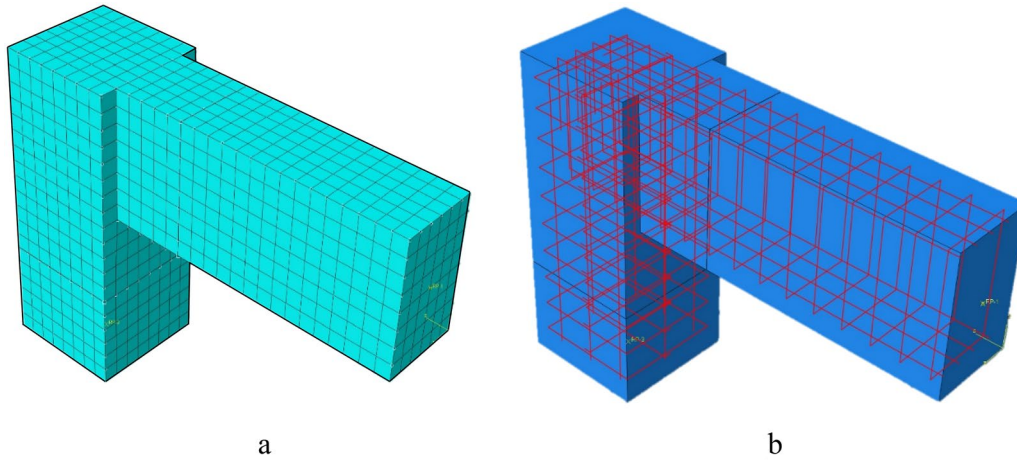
RC knee beam column a mesh and b embedded steel reinforcements
